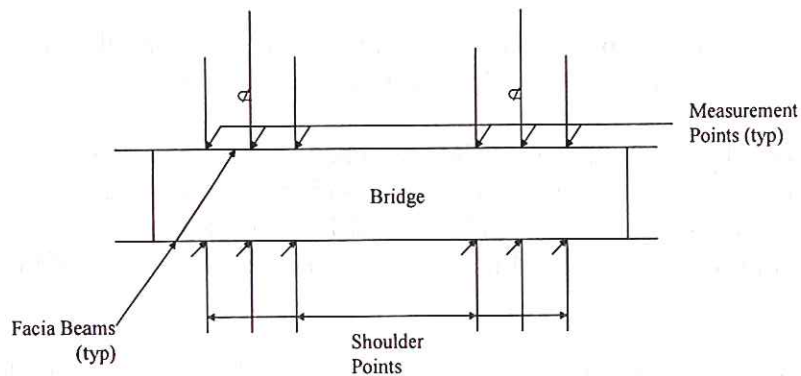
Bridge and underpass Clearance for Projects over an existing road
